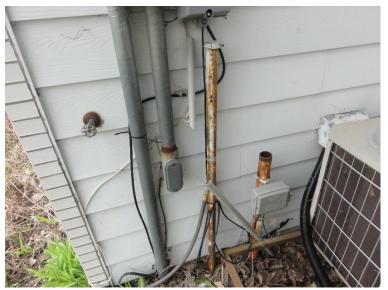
View of vent and fill pipes, likely associated with former UST, entering the ground on the northeast corner of the residential building.
